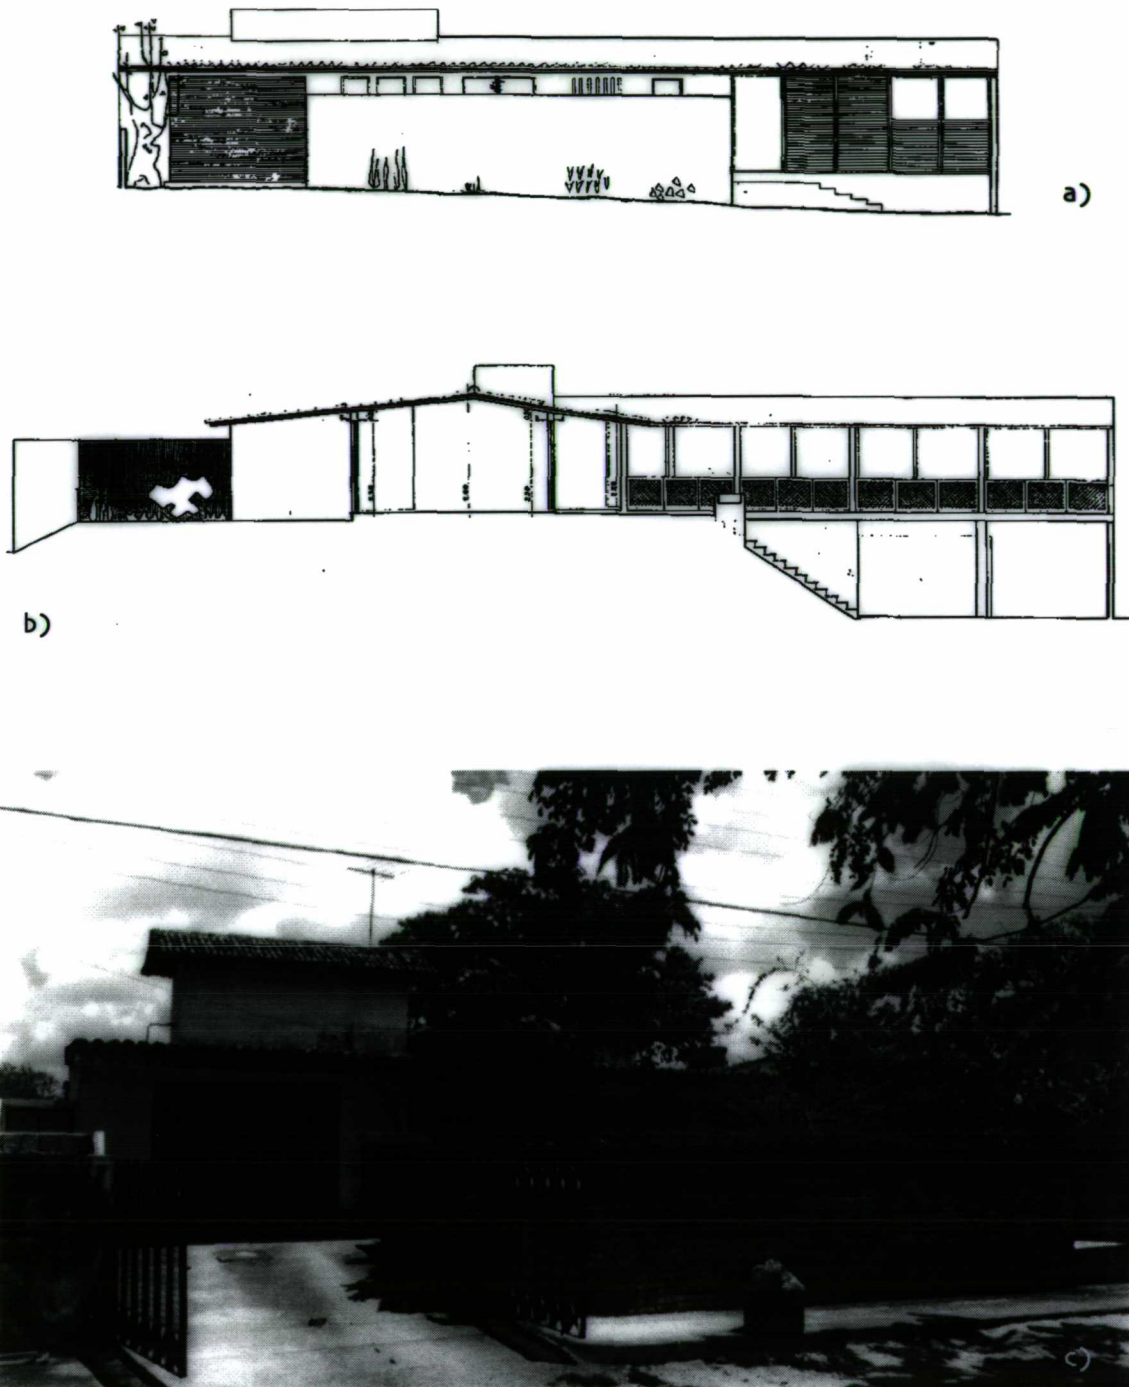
Domingues House: a) main façade b) section c) view from the street
